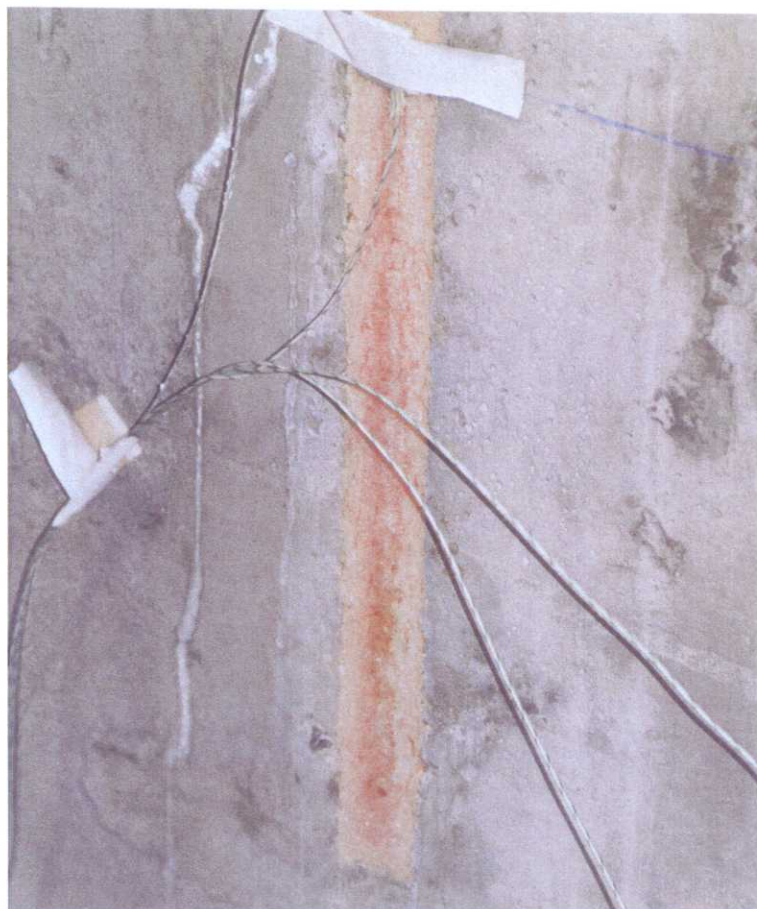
Detail of seal C, 20 mm, and seal D, 10 mm, at 2 h of test
